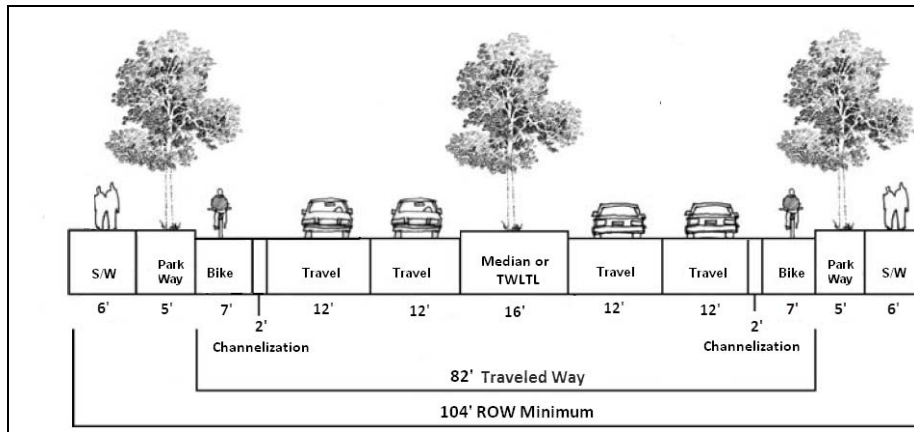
Regional Highway-Typical Broad Street Cross Section
